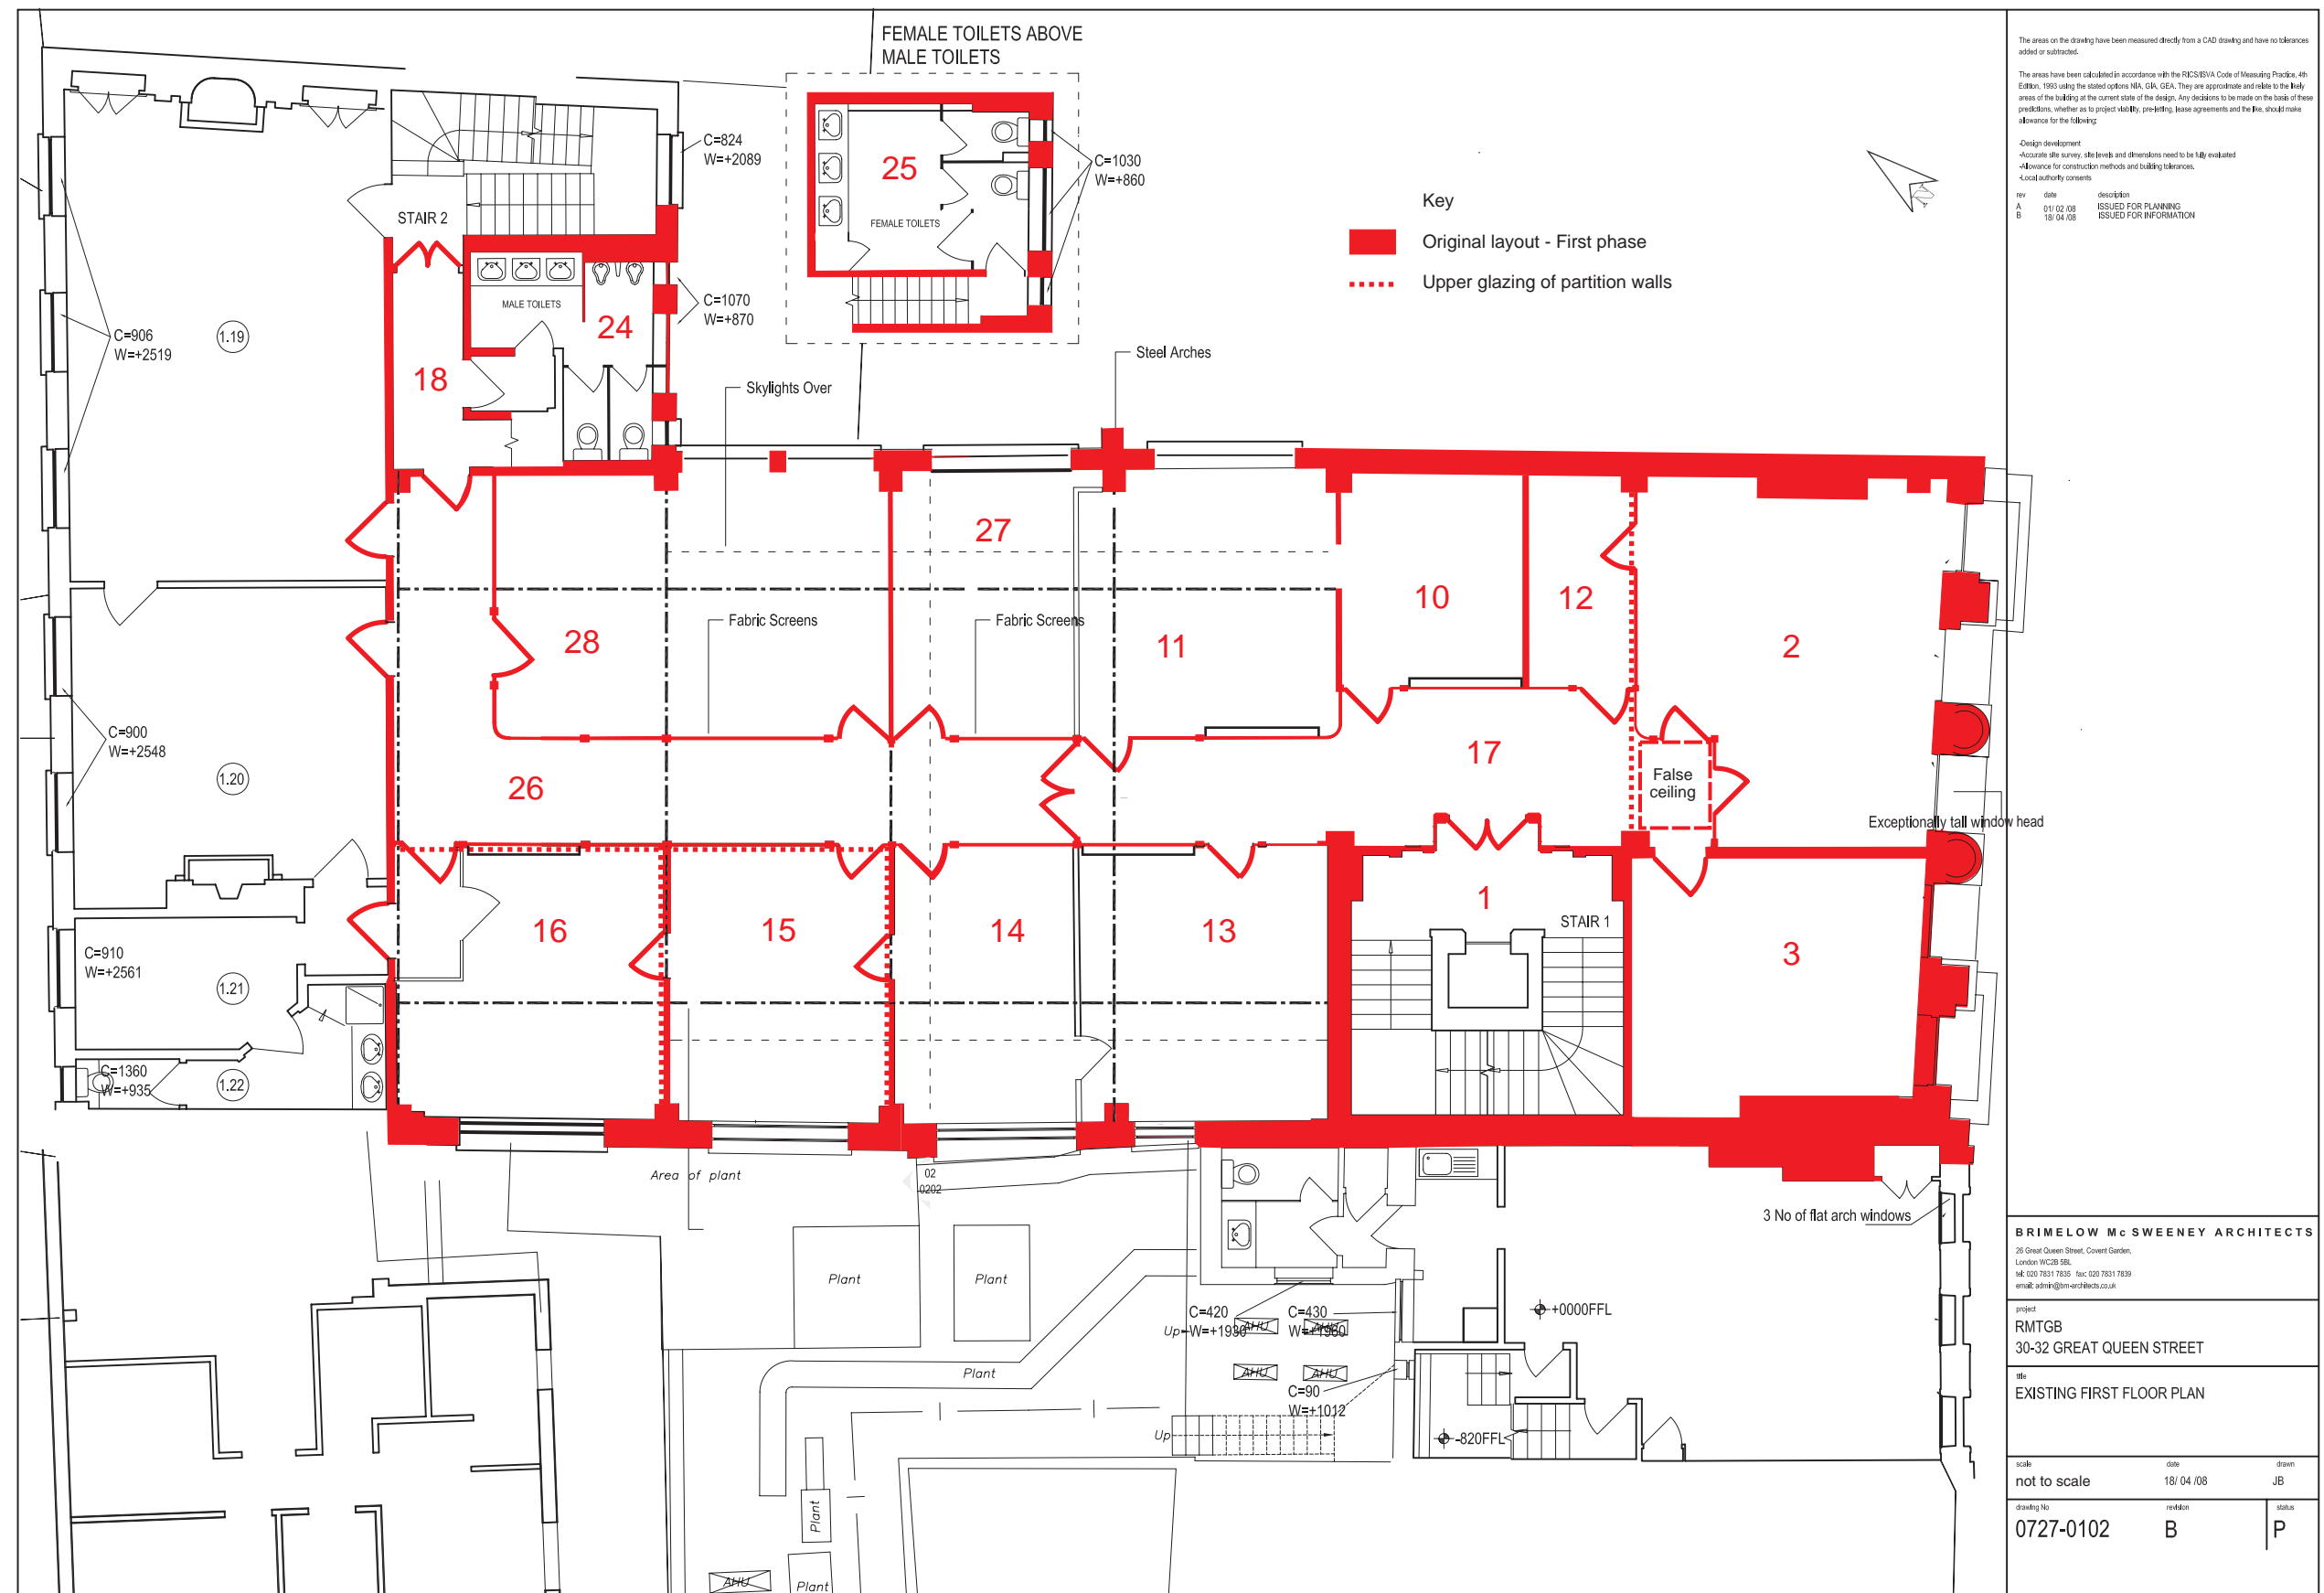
Reconstruction of the original first-floor layout at 30-31 Great Queen Street
